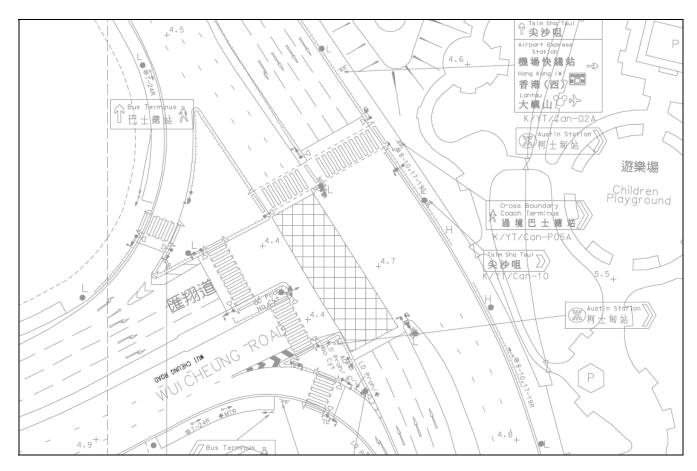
Planned Junction Layout of Canton Road/Wui Cheung Road without Underpass (J15A)
